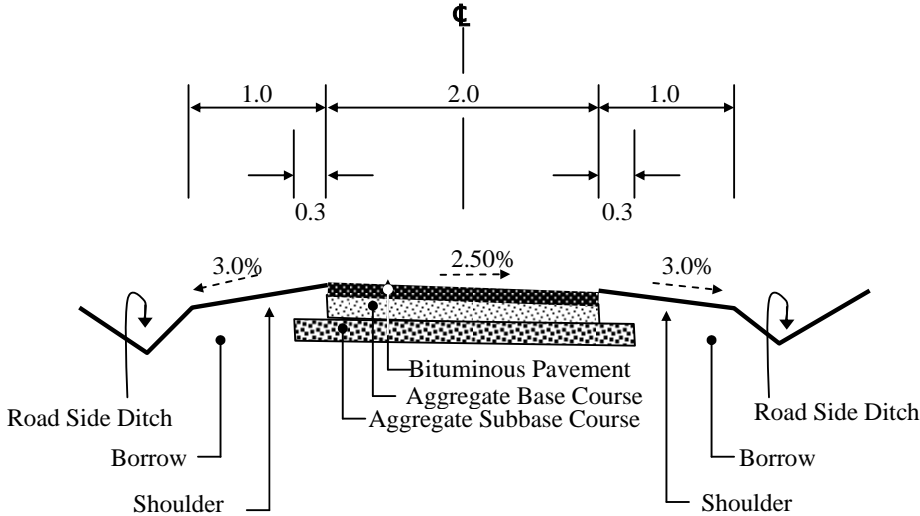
Typical Cross Section of One-Lane Bituminous Pavement
